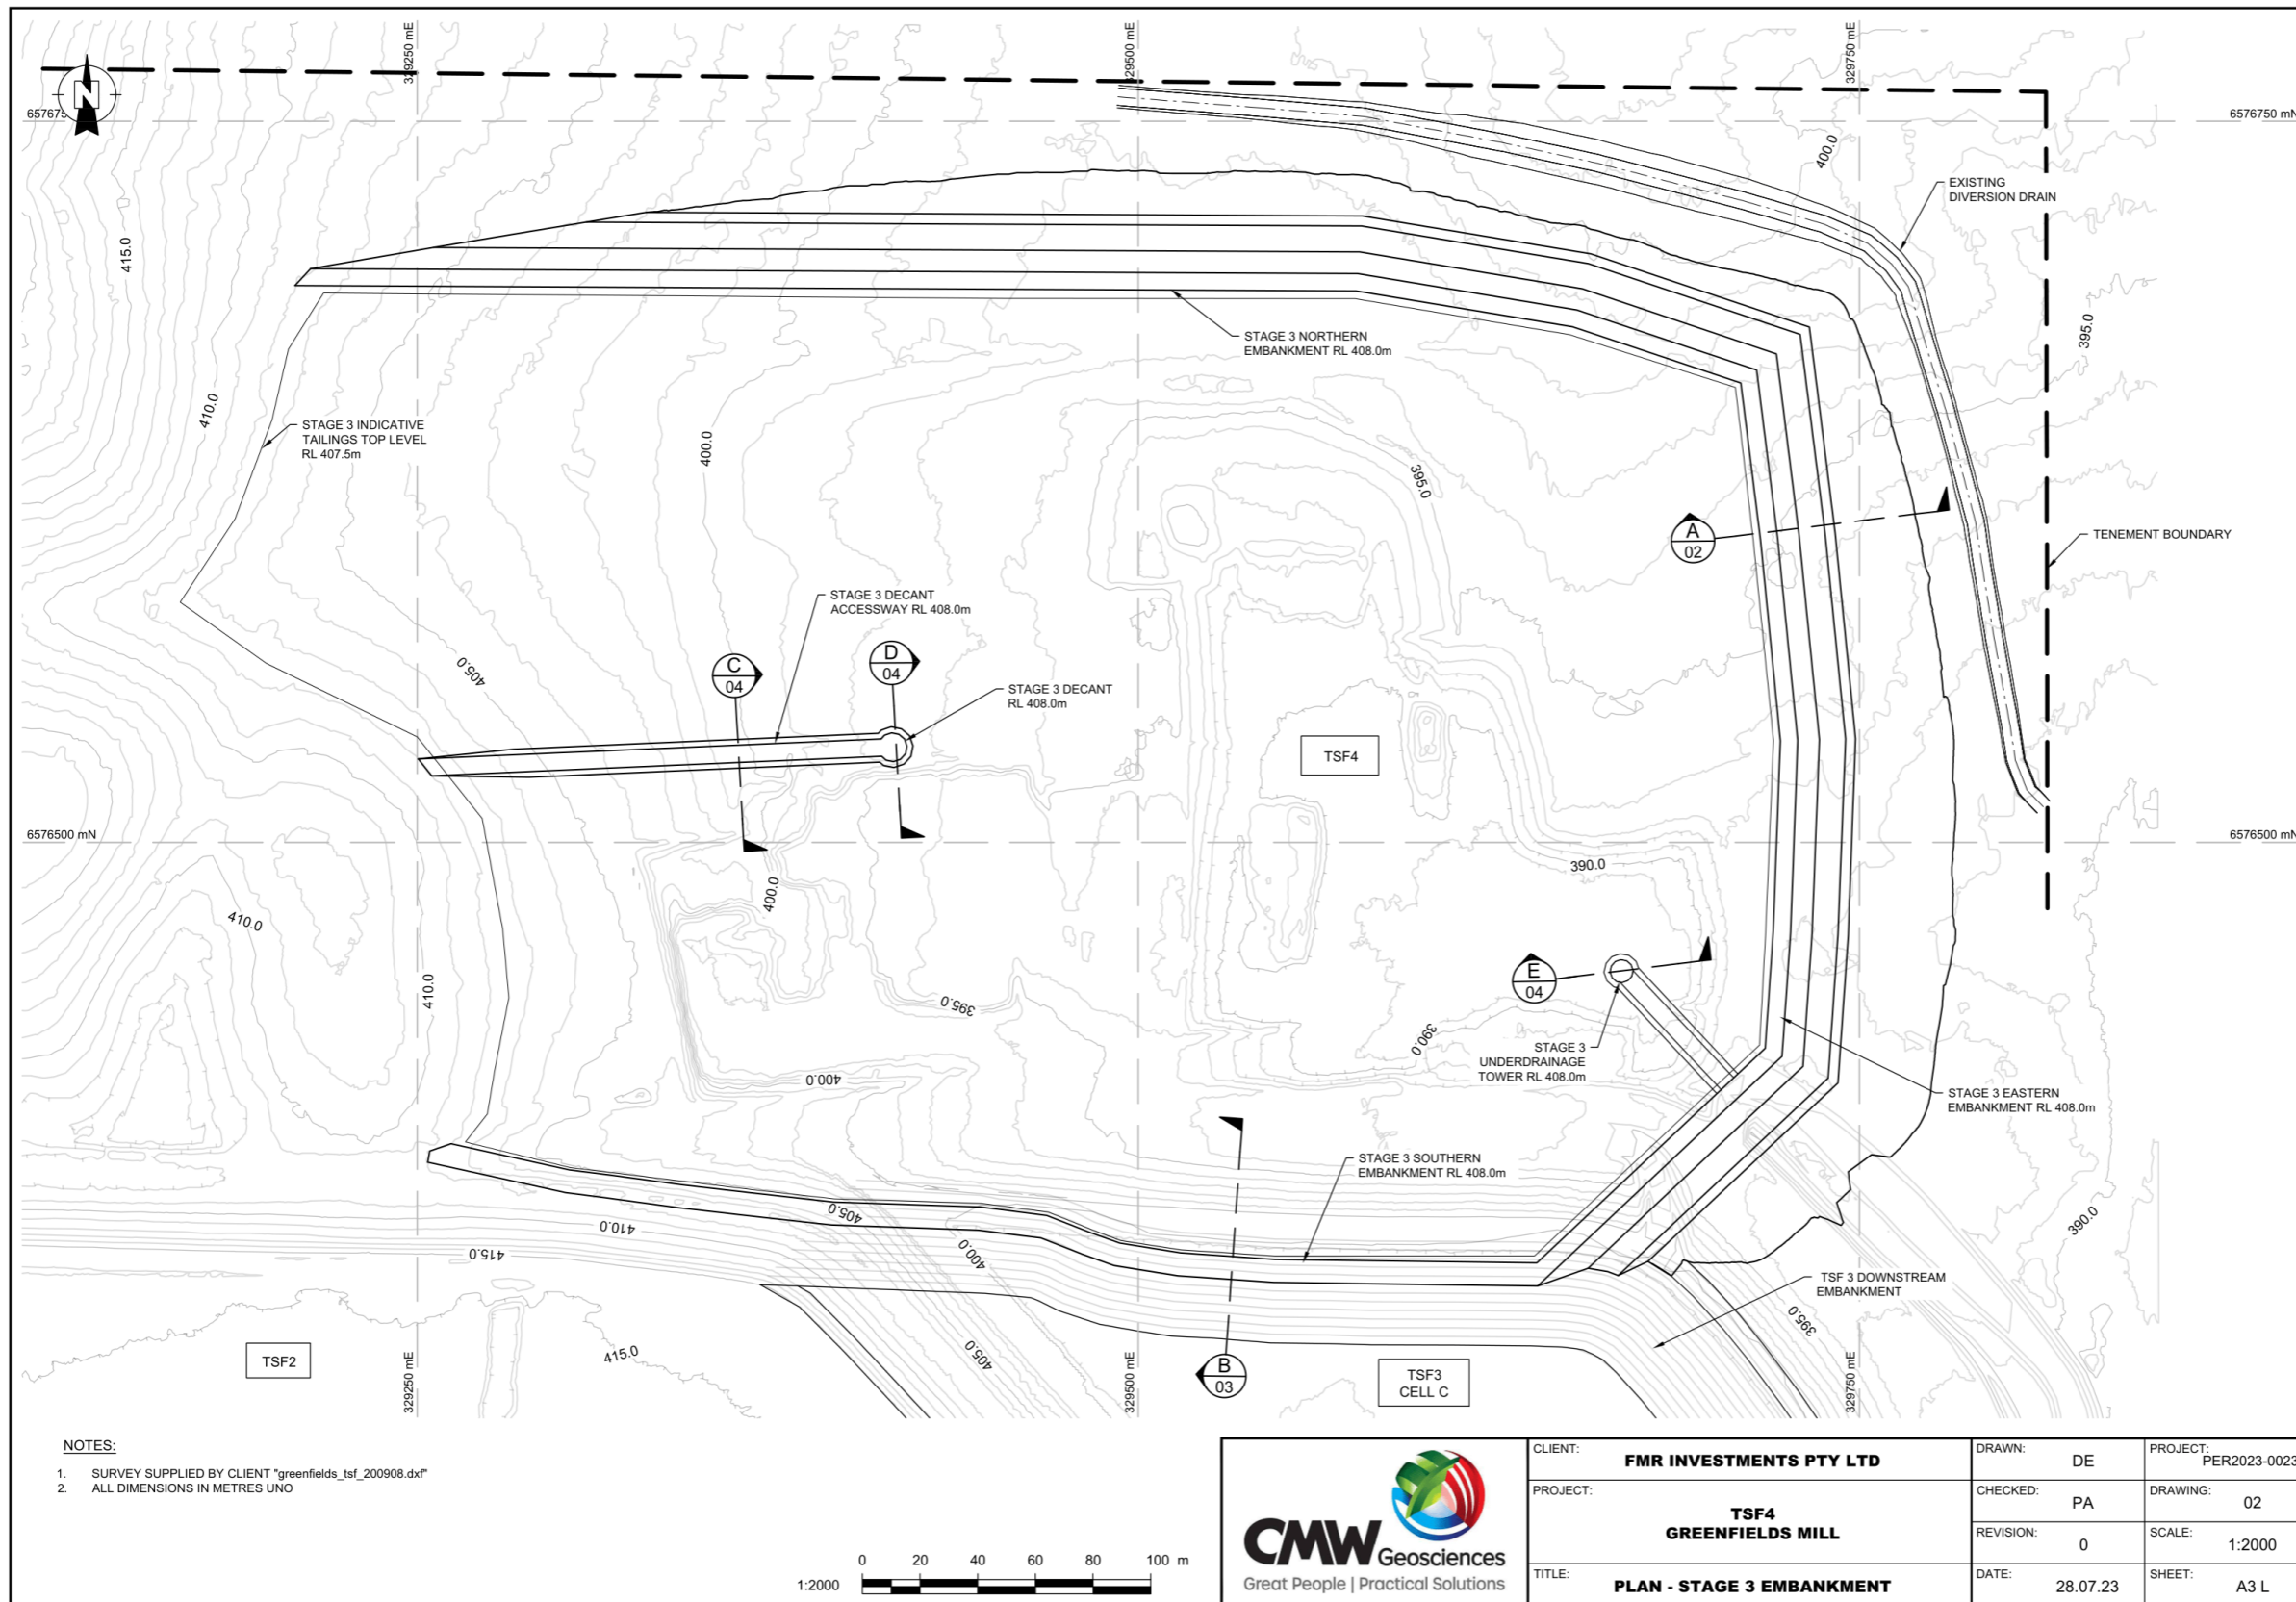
Design drawing for TSF4 Stage 3 embankment raise
